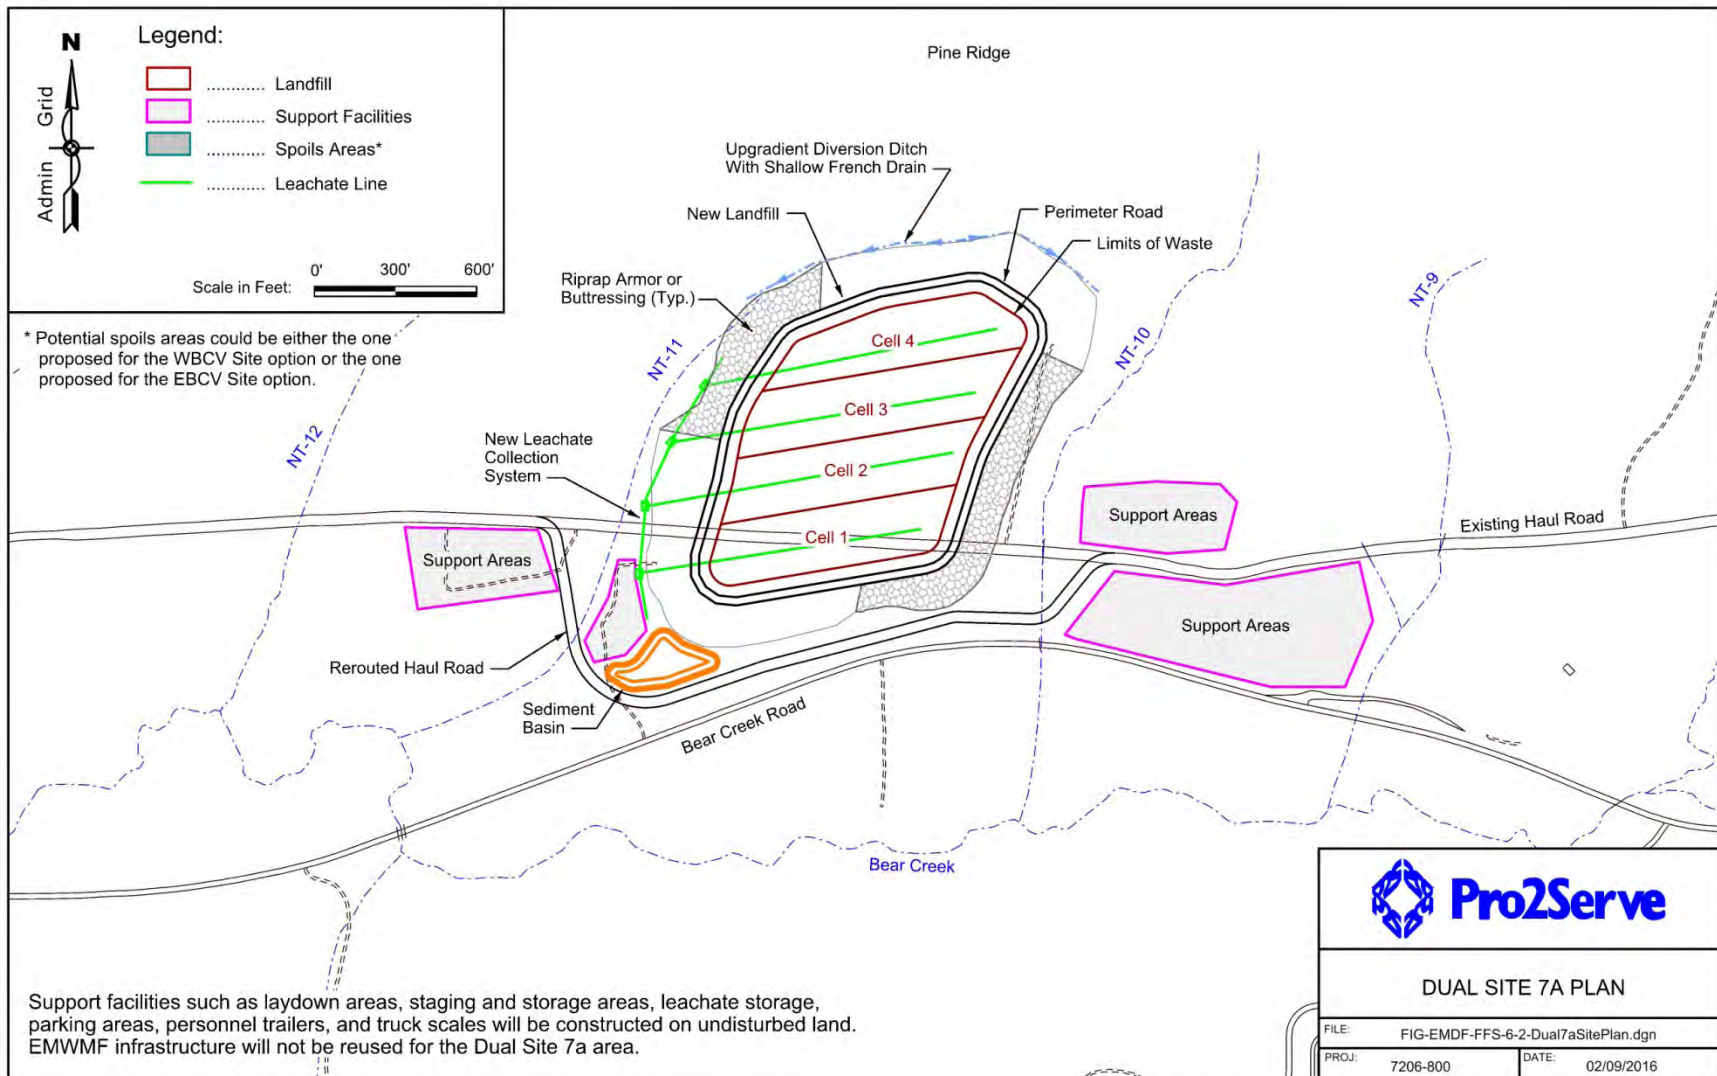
On-site EMDF Conceptual Site Layout Plan at Site 7a of the Dual Site
